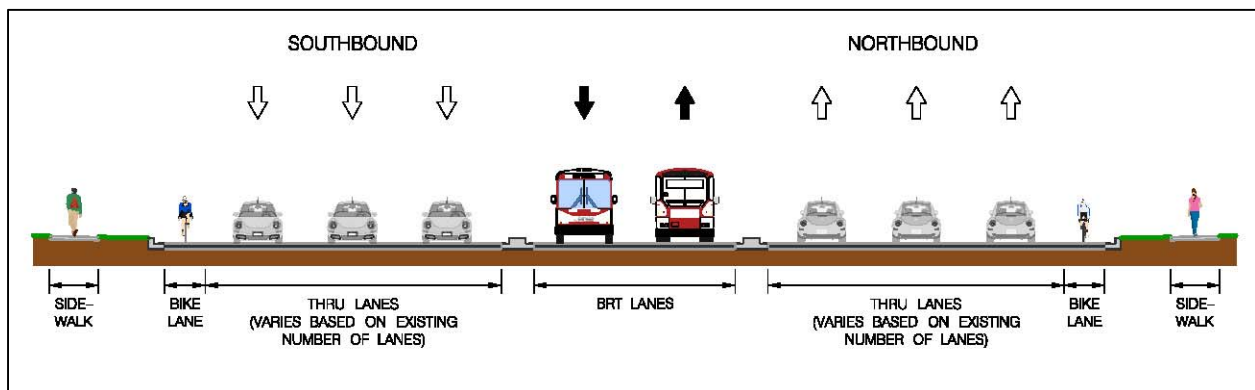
Alternative 3C - Section 3: Rockville Town Center
